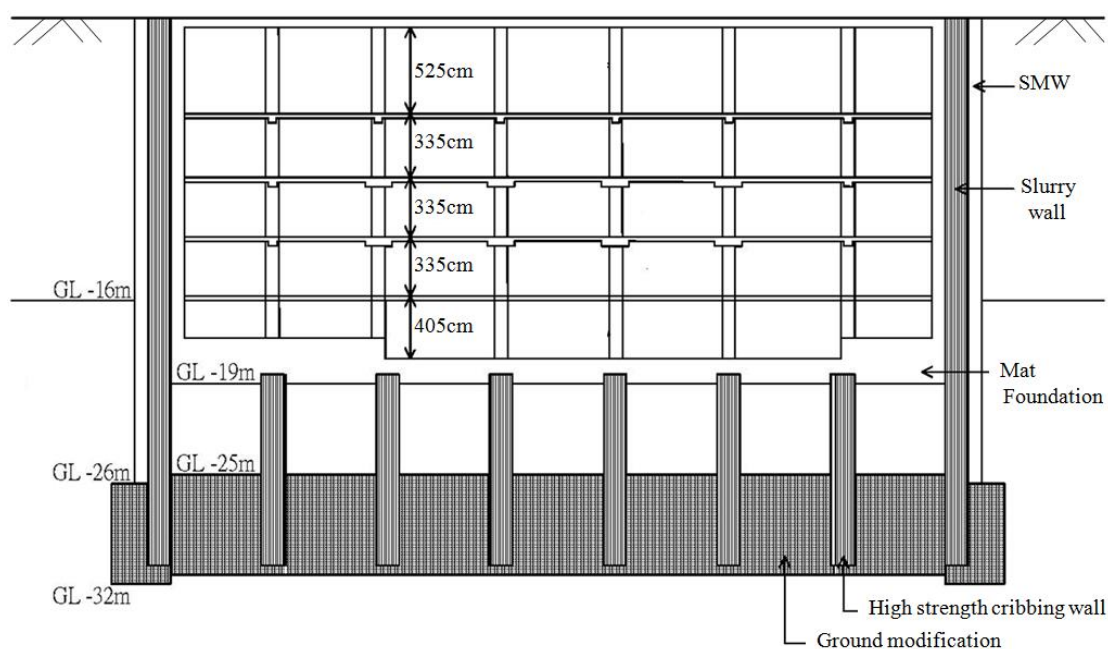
Section of underground buildings (Ou and Hsieh, 2004)
